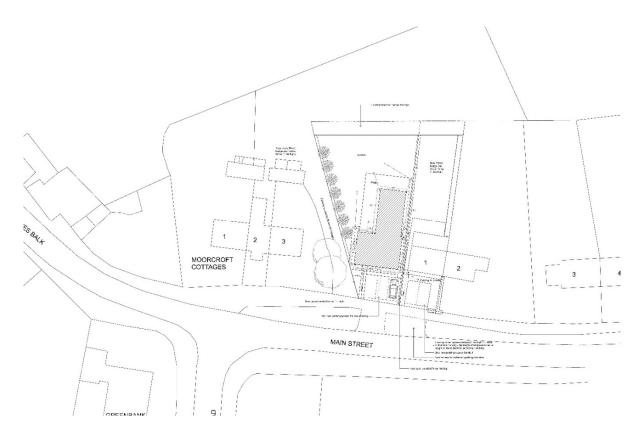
Site Location Plan (extract from Hall Architecture drawing no. 3330 PL20 sheet 01Rev B)
